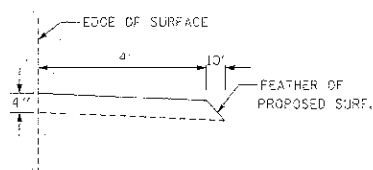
DETAILS OF SURFACING AT INTERSECTIONS AND SIDEROADS
